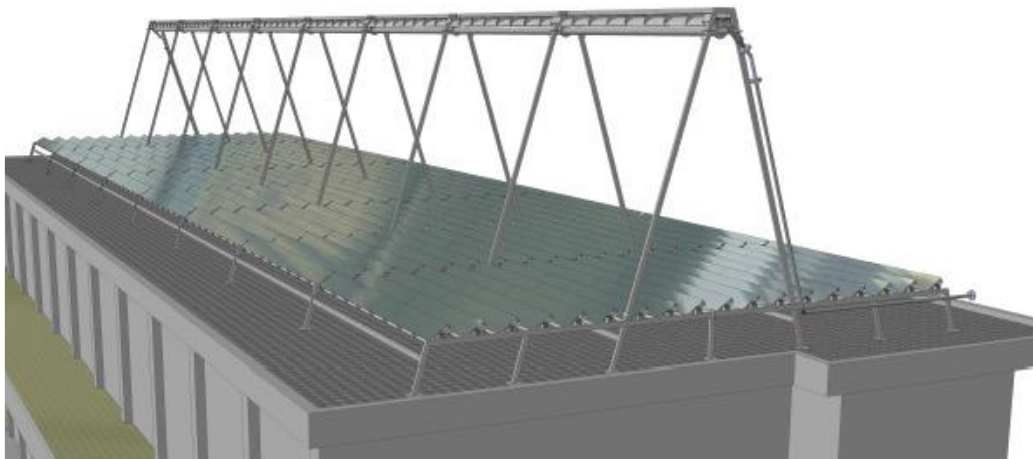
3D rendering of 8 modules of LFR Solar field installed on a roof of a building
